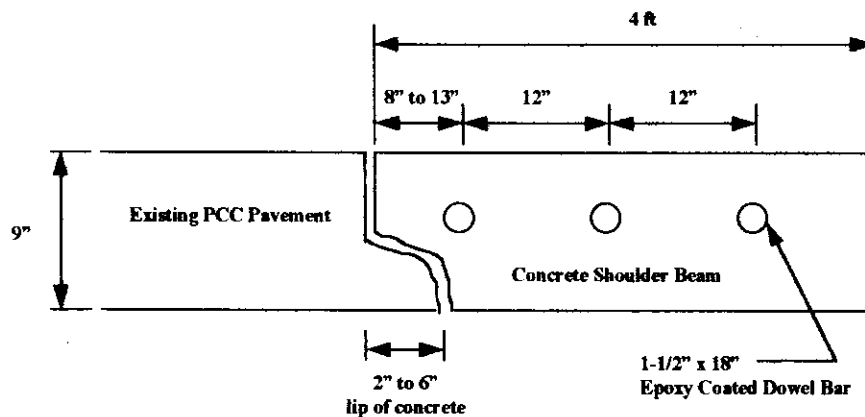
Dowel Bar Placement Detail for Concrete Shoulder Beam.
